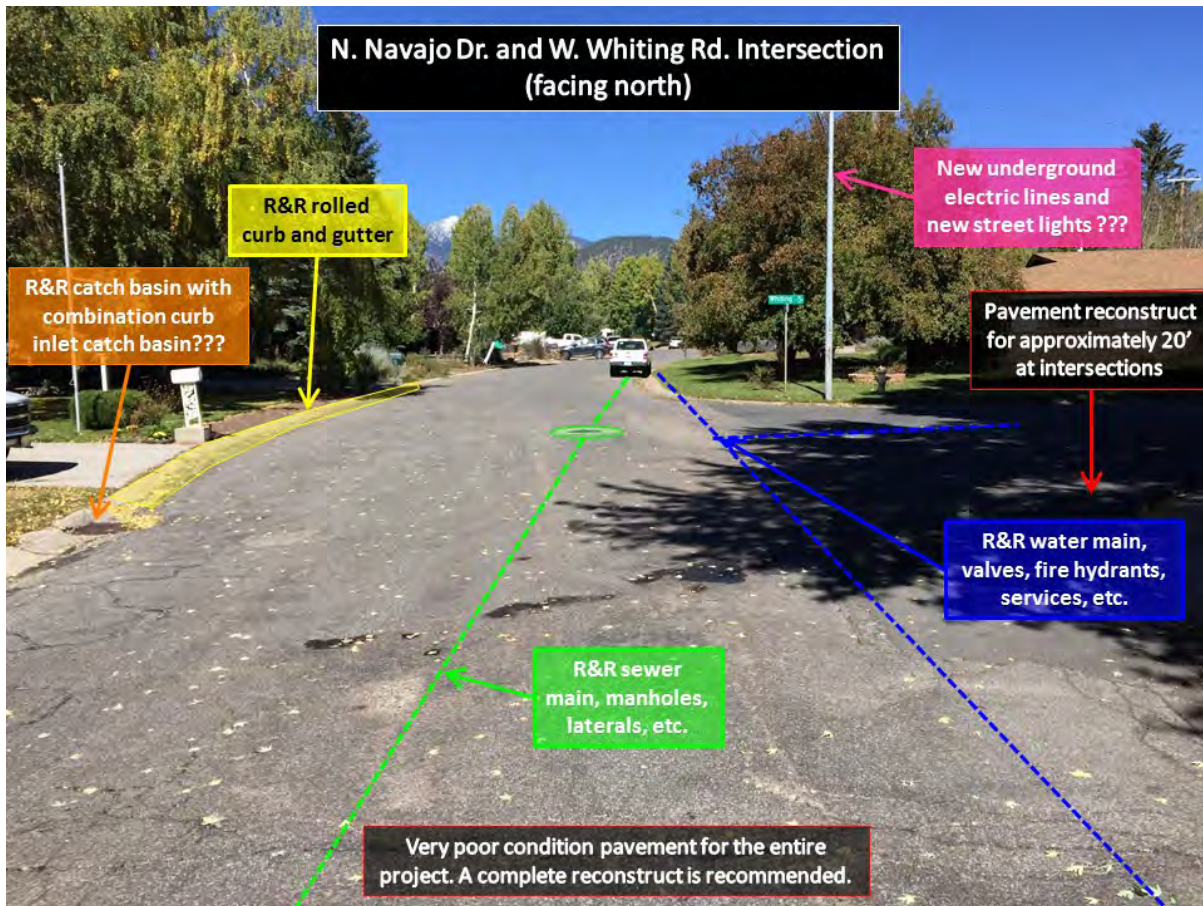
R&R water/sewer mains & appurtenances, pavement section, catch basin???, and street lights??? .
